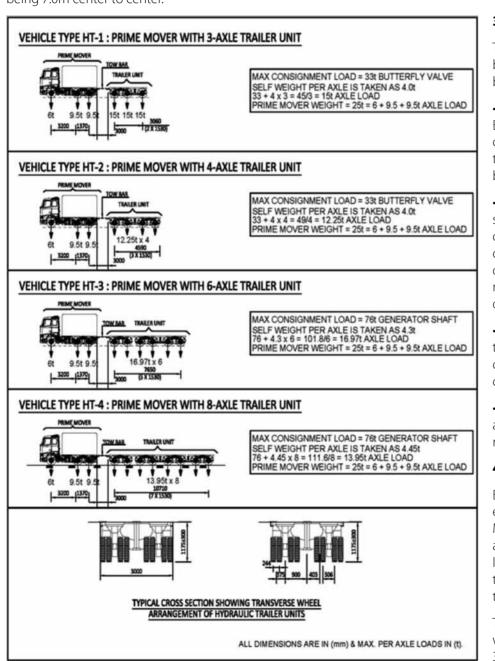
Details of OWC Hydraulic Trailers (Axle Arrangement and loads)
